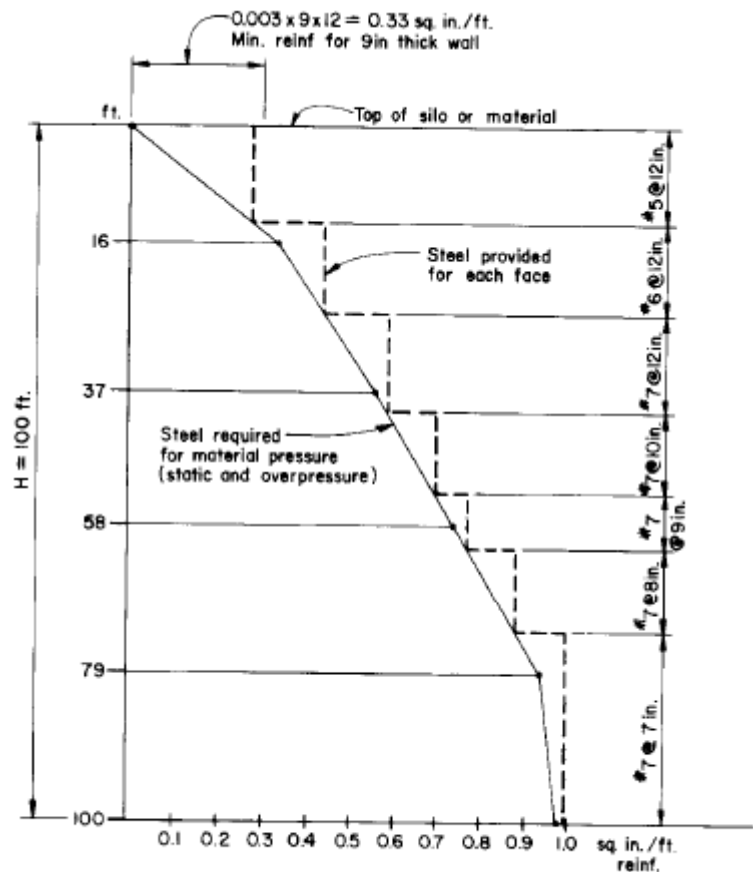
Horizontal reinforcing for silo wall (Example 16-5).
